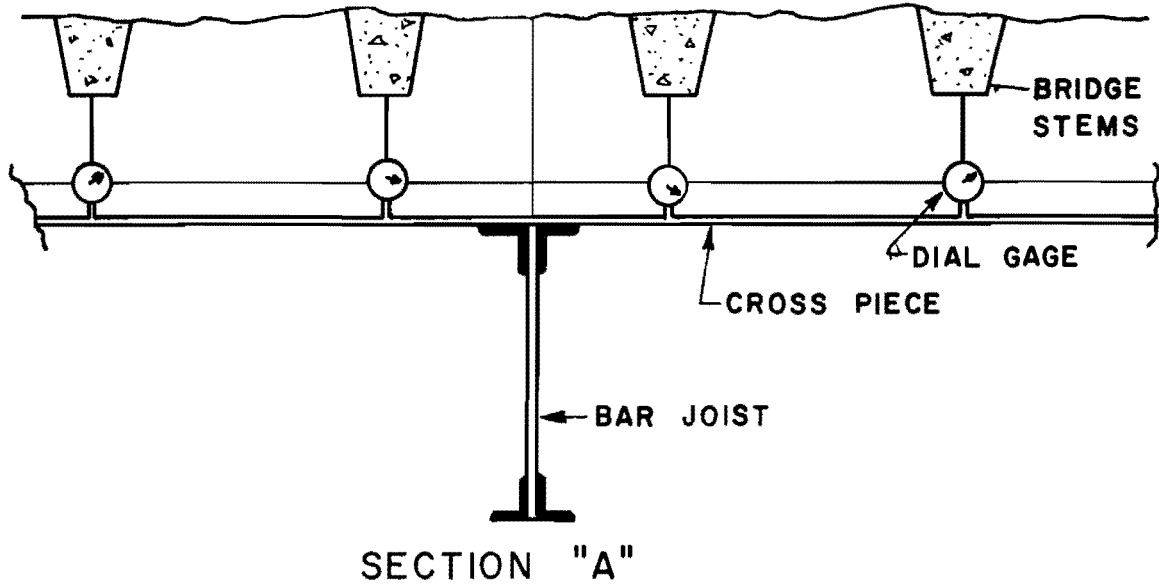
DEFLECTION BRIDGE SECTIONS
